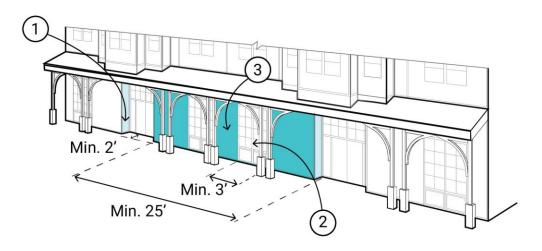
(B)(4)(b)(i): Façade requirements, certain streets — VMU District
